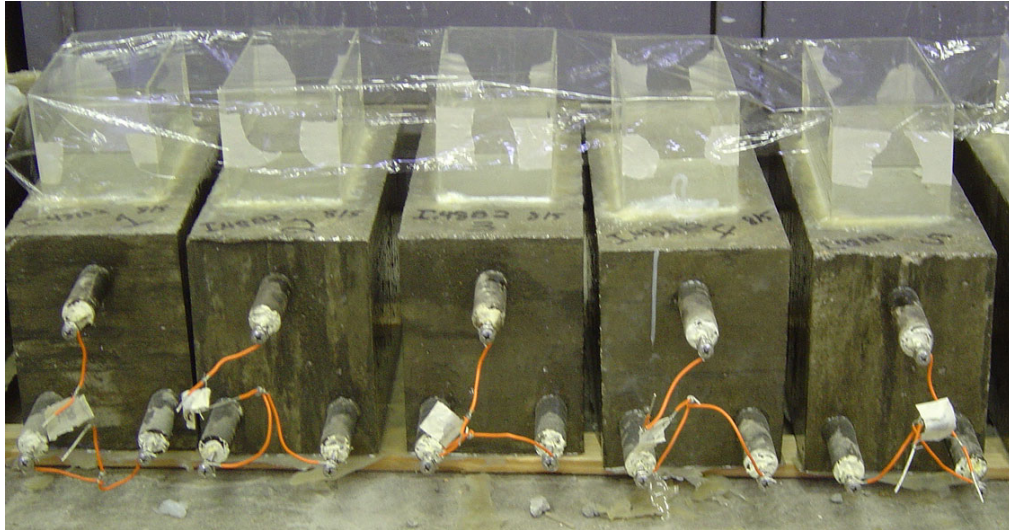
Completed Specimens Pondered with 3% NaCl Solution
